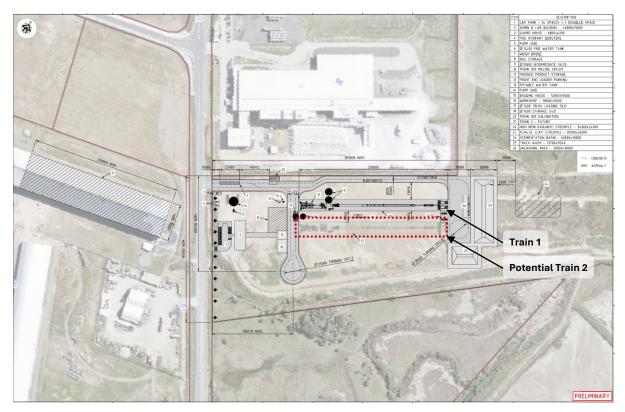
Proposed AusPozz™ Manufacturing Facility Area Site Layout
